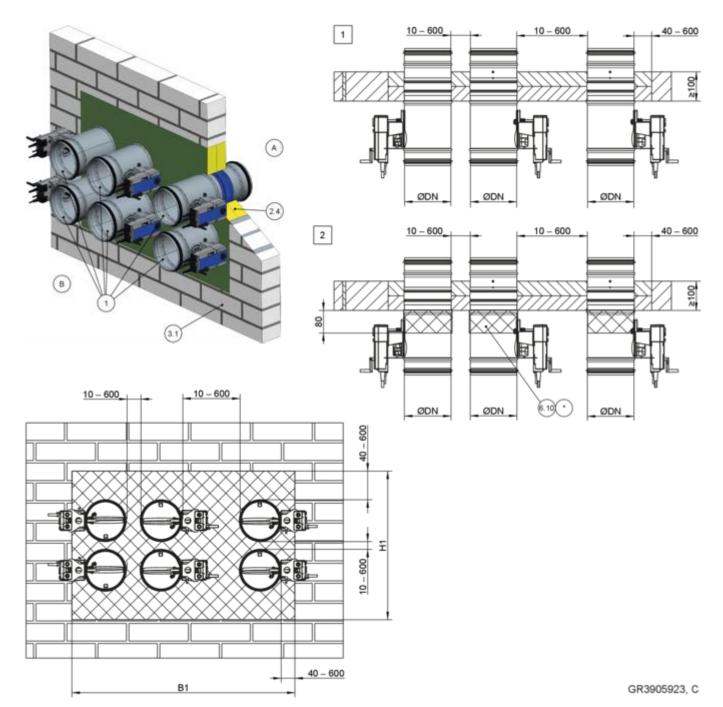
Dry mortarless installation with fire batt in solid wall - multiple occupancy of an installation opening
